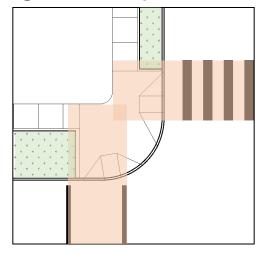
Unacceptable: Crosswalks Lead into Stormwater Facilities
